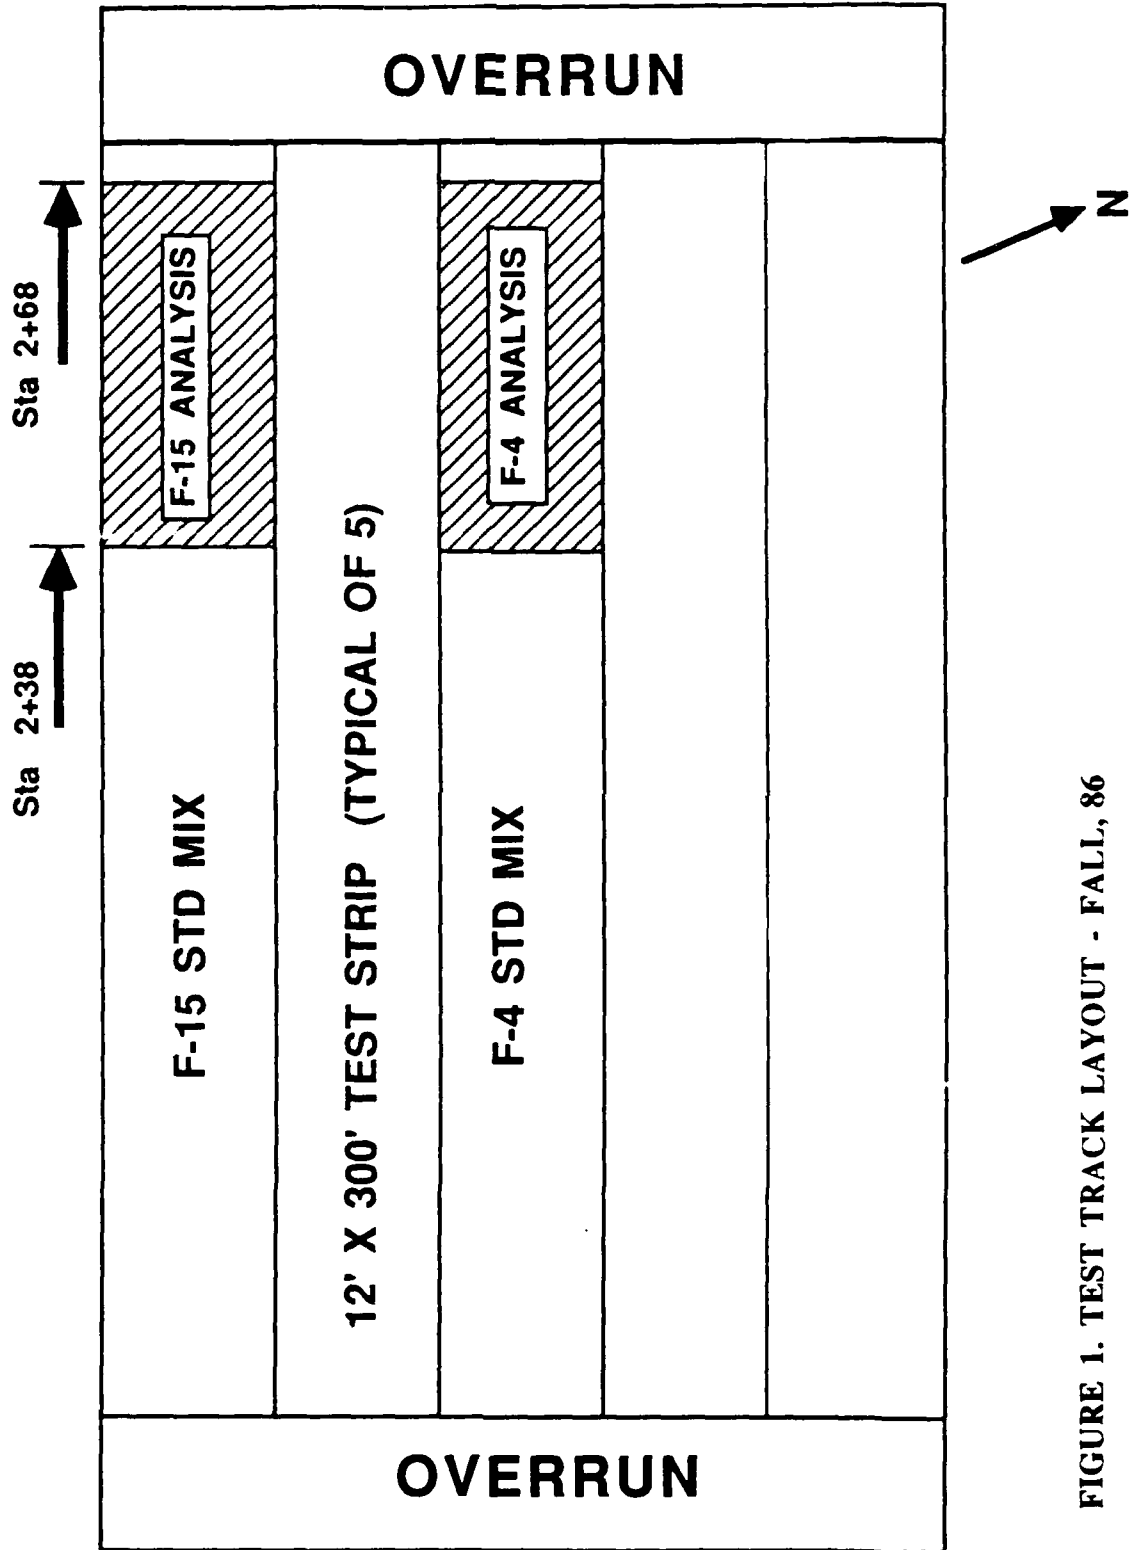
TEST TRACK LAYOUT - FALL, 86
